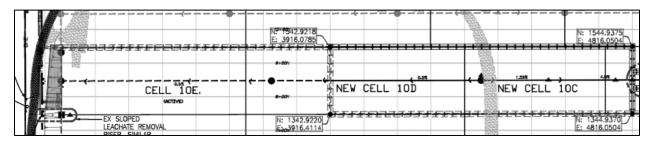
Engineering site plan top view of North Slope (City of Enid)
